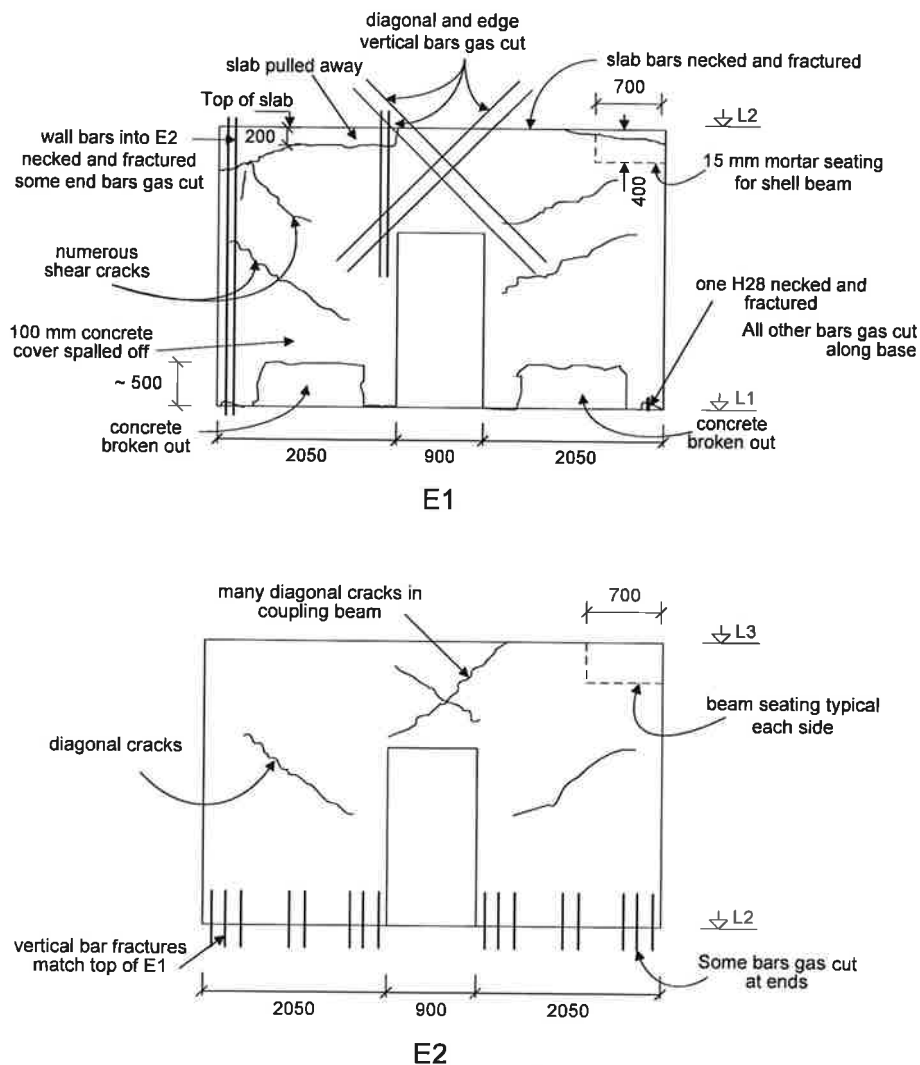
Line 1 South Wall remnants (top) E1 Level 1 to 2; (Bot) E2 Level 2 to 3.
